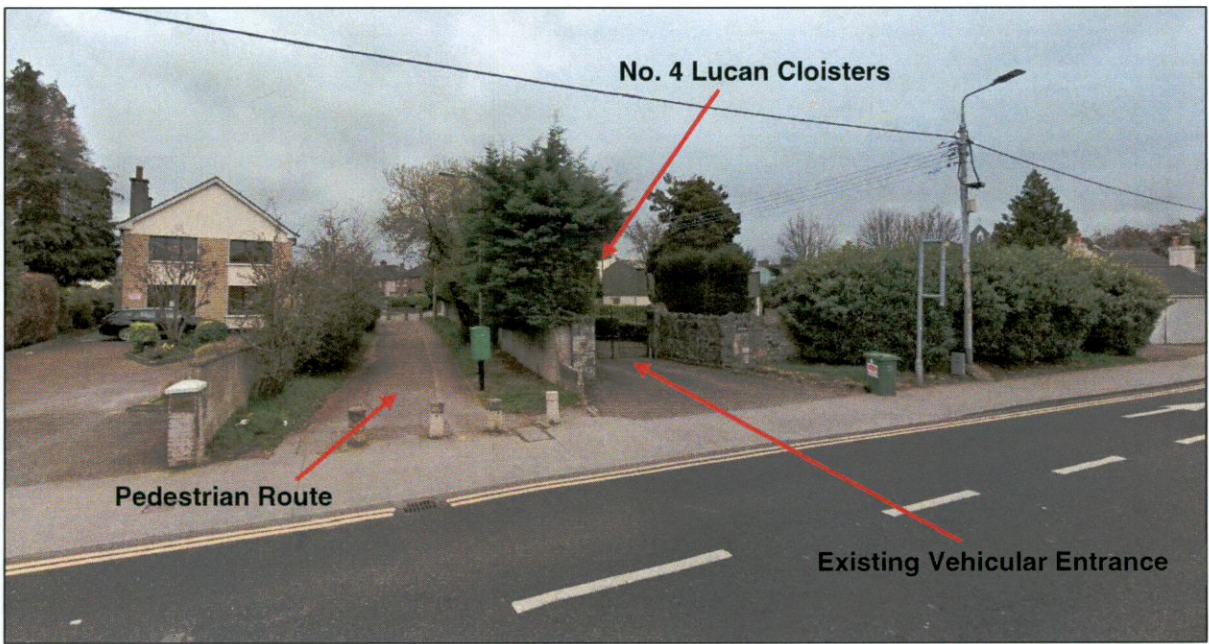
Street view of the subject site, showing the existing entrance, the public pedestrian routes, and No. 4 Lucan Cloisters in the background.
